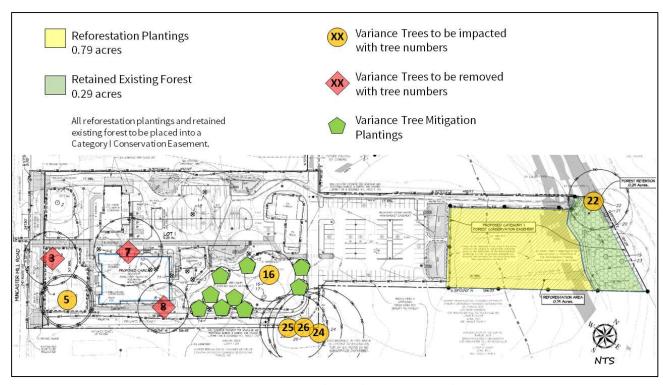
Forest Conservation Plan and Tree Variance Plantings
